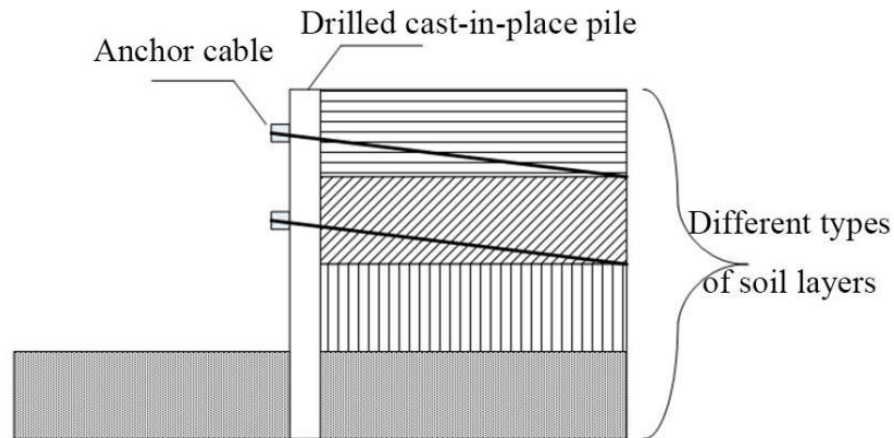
Schematic diagram of pile anchor support for deep foundation pit
